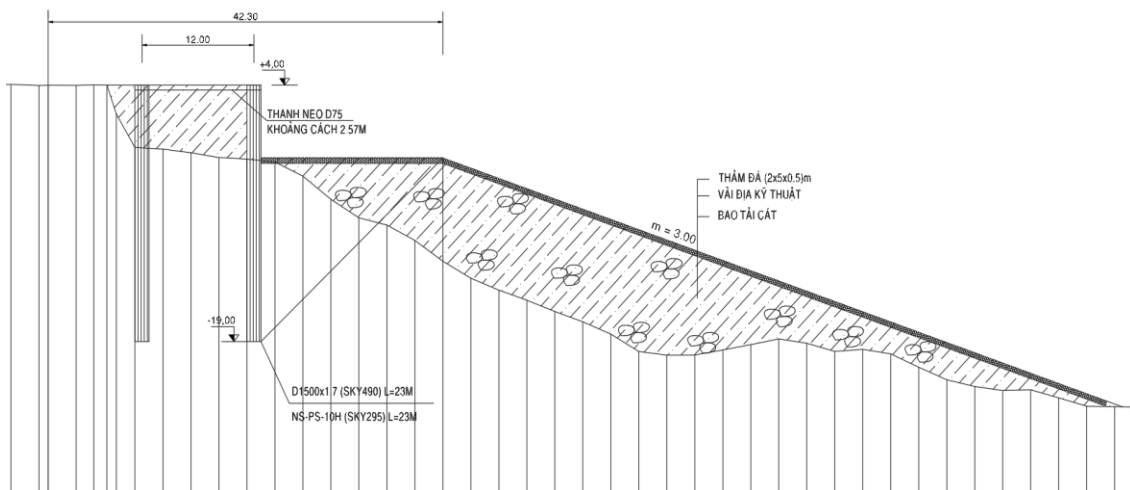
Cross section jointly arranged with combined pipeboard – steel sheet piles, D1500x17+NS-SP-10H.
